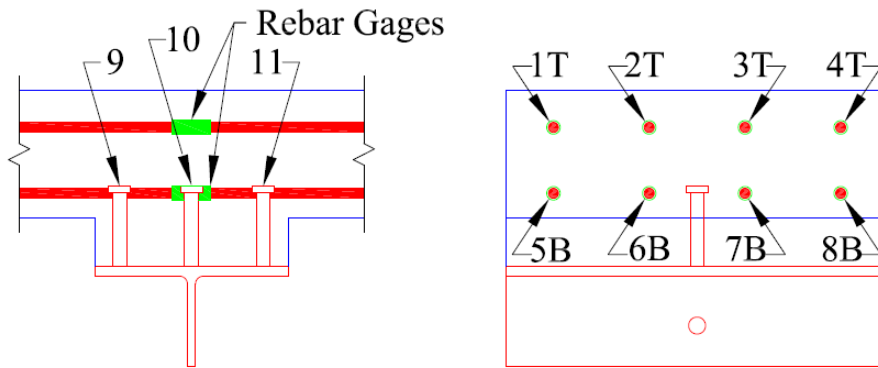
Labeling Scheme of Gages (a) in Studs and (b) on Reinforcing Steel
